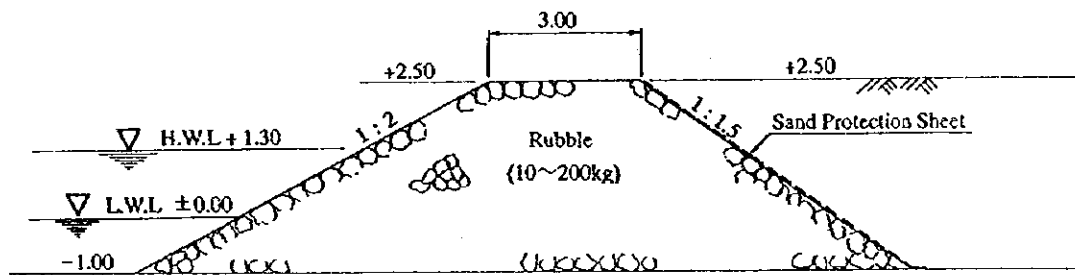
(3) Typical Cross Section of Revetment for Road (Rubble)
